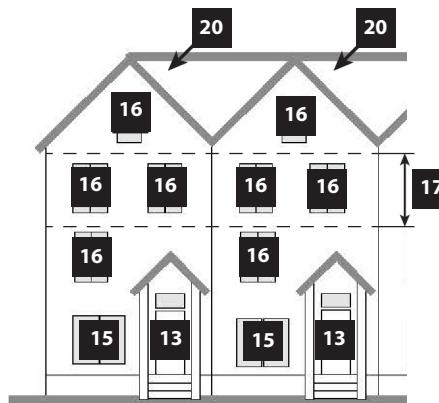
Row building street facade diagram shown with porch entry type and pitched roof type. Not to scale.
